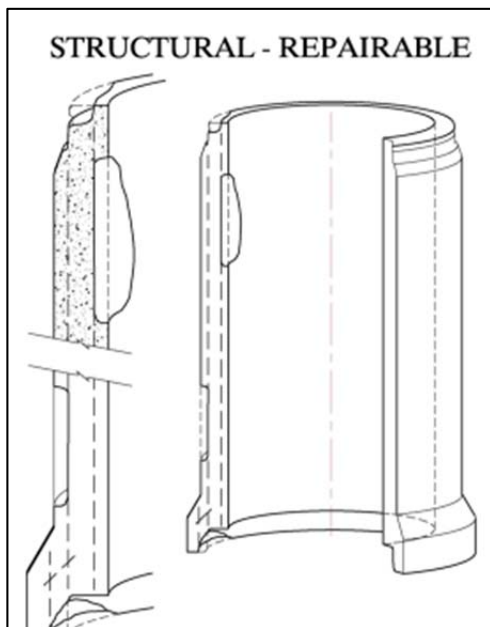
Illustration of a pipe that has structural damage that can be repaired.
